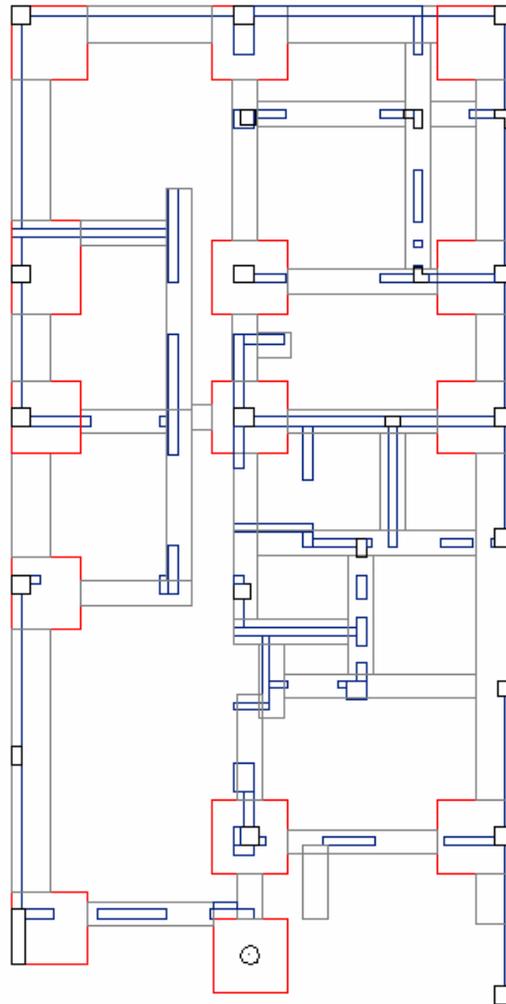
A confined masonry 3-storey building foundation/ground floor structure outline plan (not to scale)
